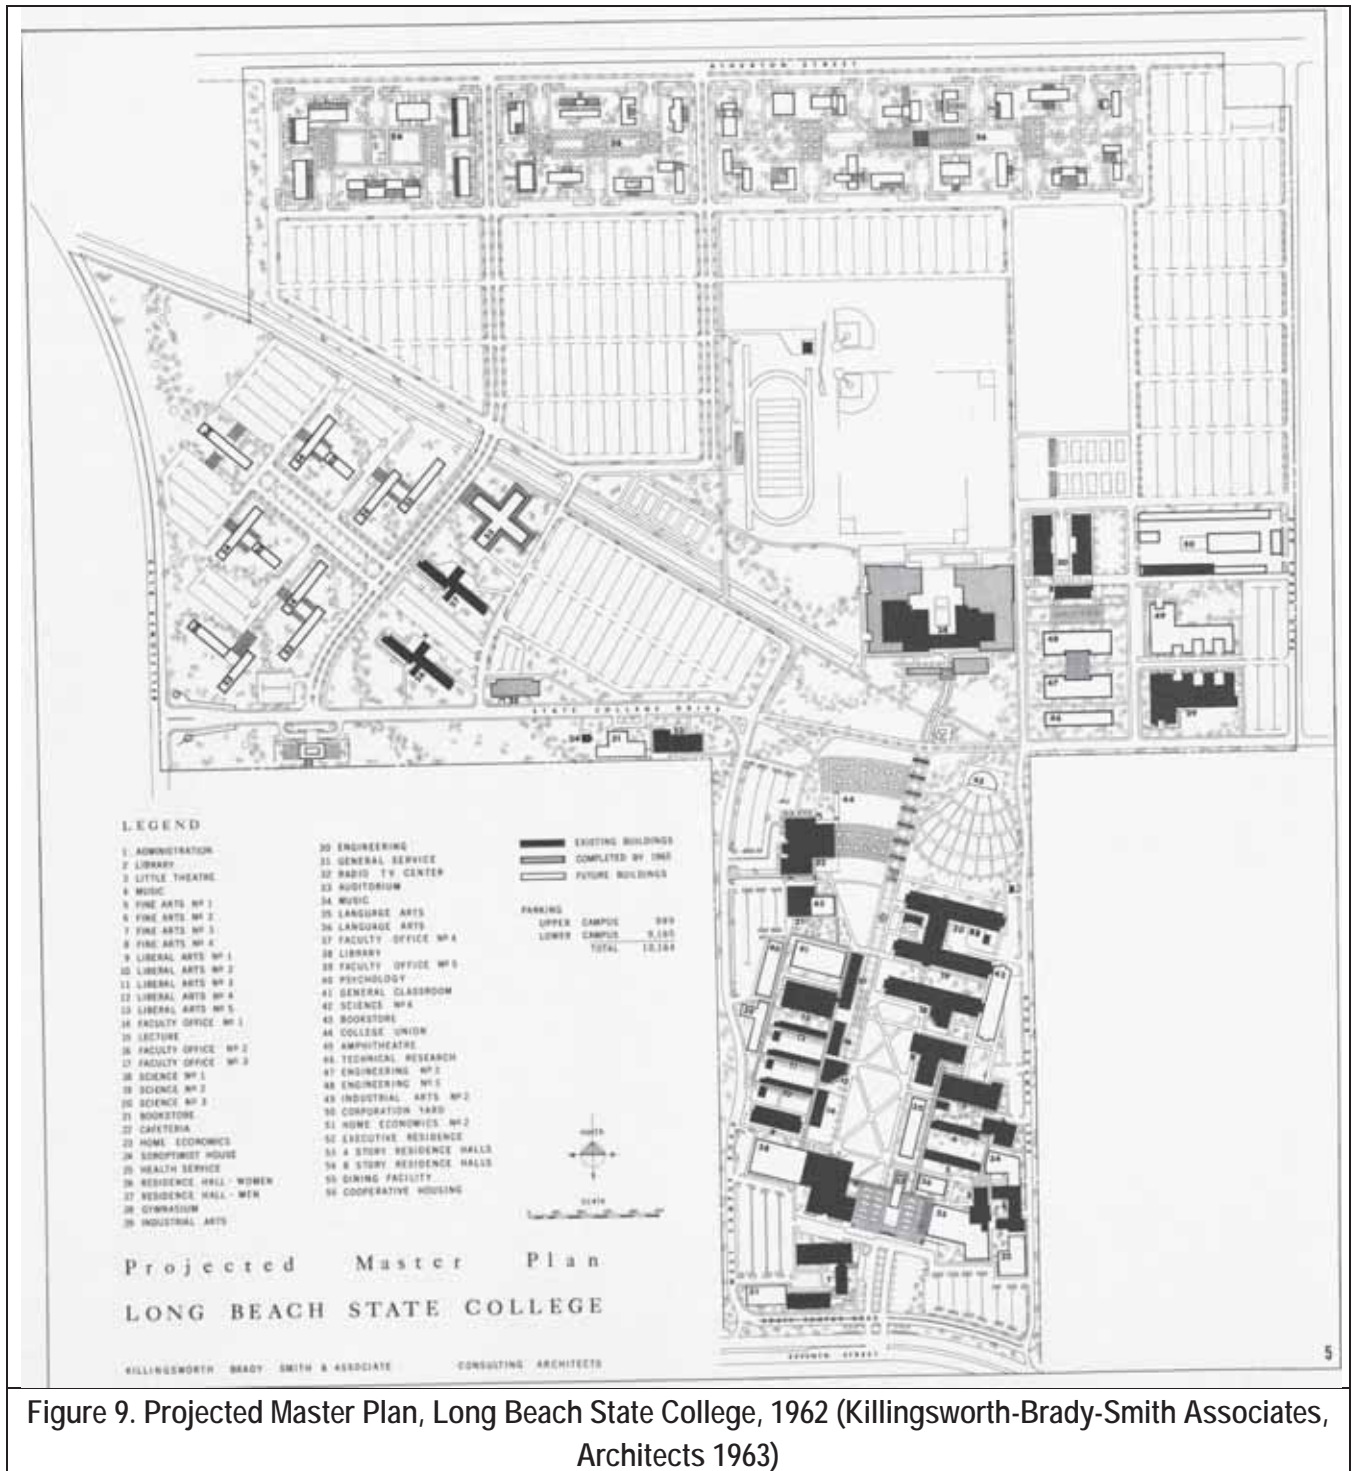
Projected Master Plan, Long Beach State College, 1962 (Killingsworth-Brady-Smith Associates, Architects 1963)
